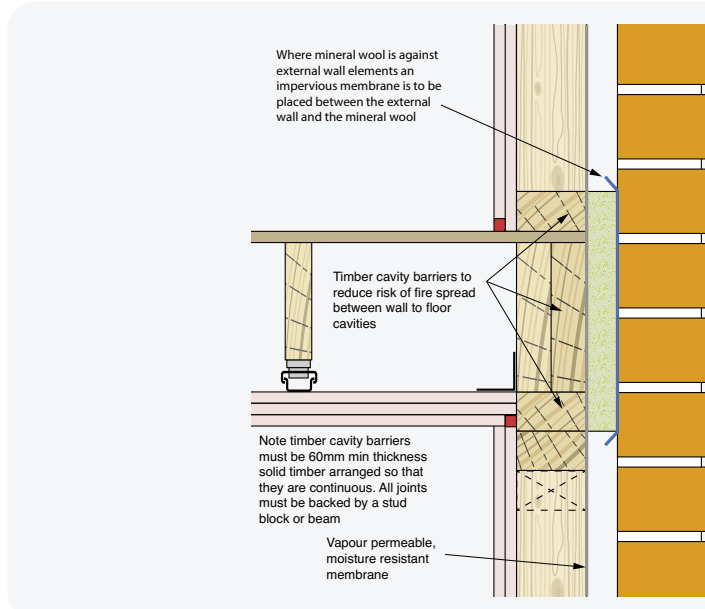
FRL 120/120/120 Fire-protected timber frame wall /floor junction with integral cavity barriers – beams perpendicular to wall.
